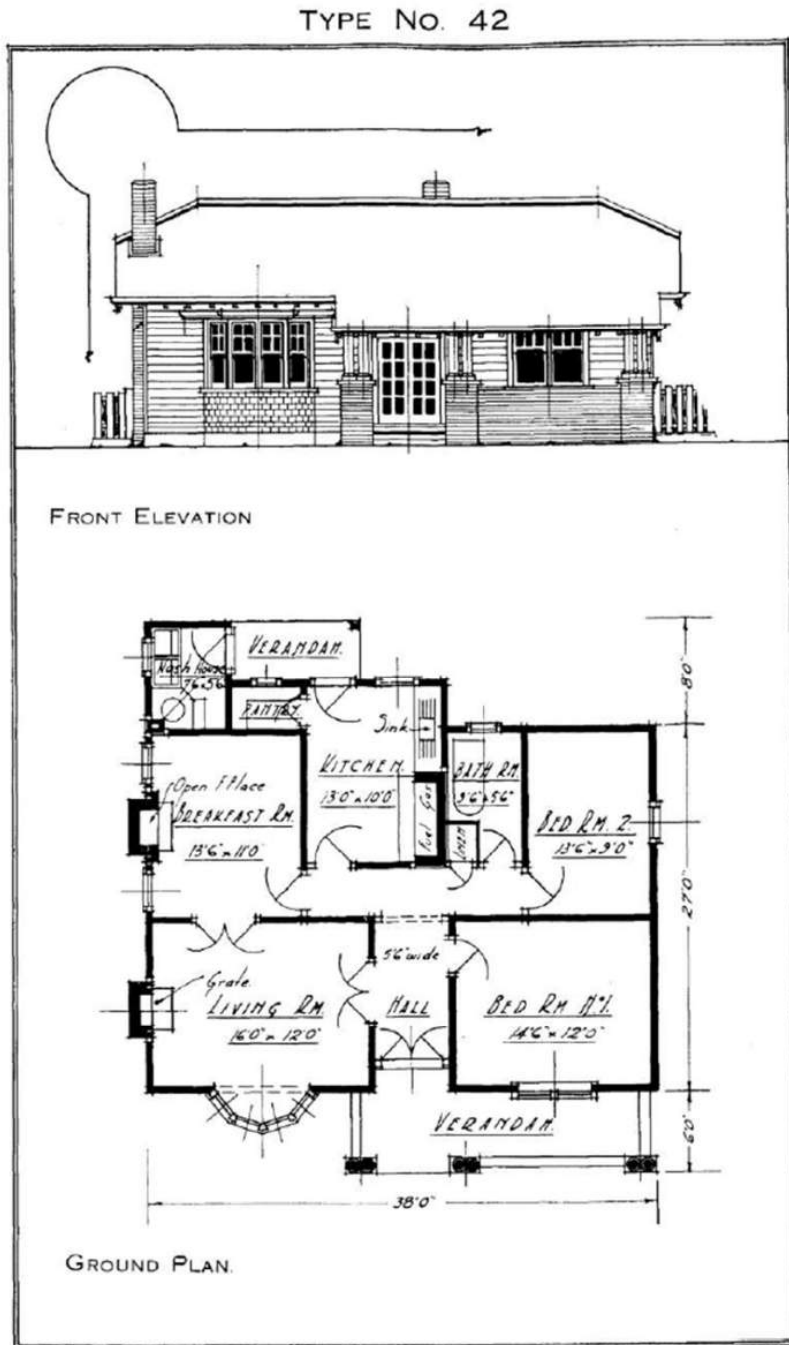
Showing the 1927 State Savings Bank Type No 42 standard plan, the design of the subject building, which was built in the period 1929-34. (Source: State Savings Bank of Victoria 1927:45)
